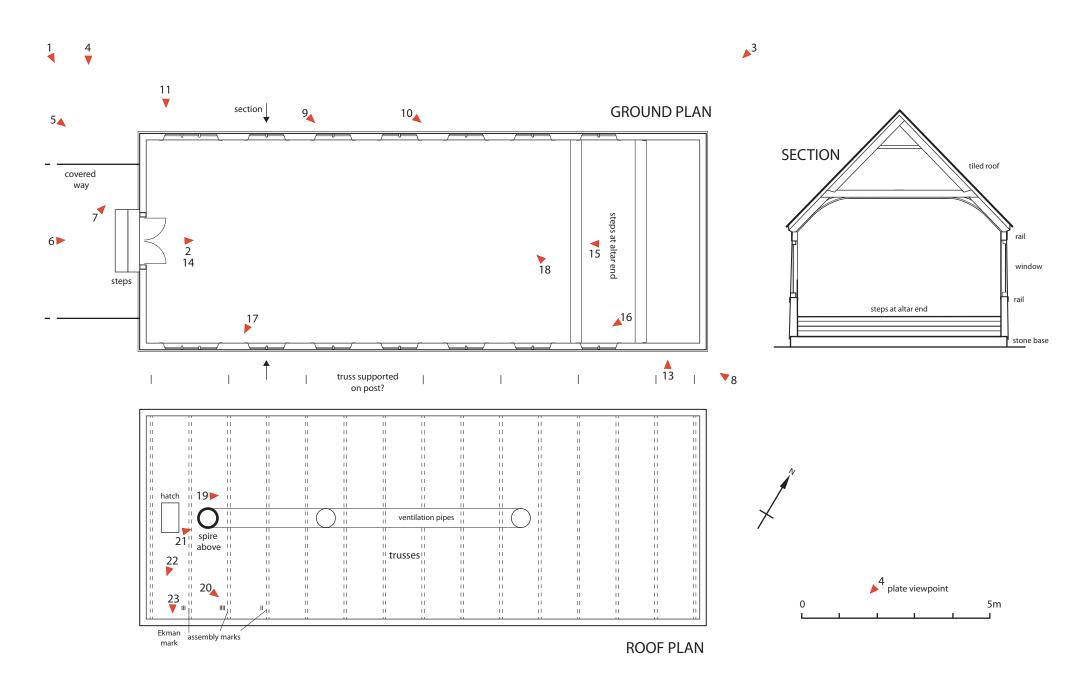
Plans of and a section through the former chapel at Stancliffe Hall, Darley Dale, Derbyshire. Scale 1:100.
